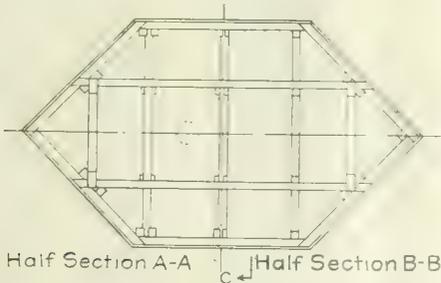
Type of Caisson Used to Enlarge Pier No. 3 of Red River Bridge No. 1. Note Bonding of New and Old Construction.
